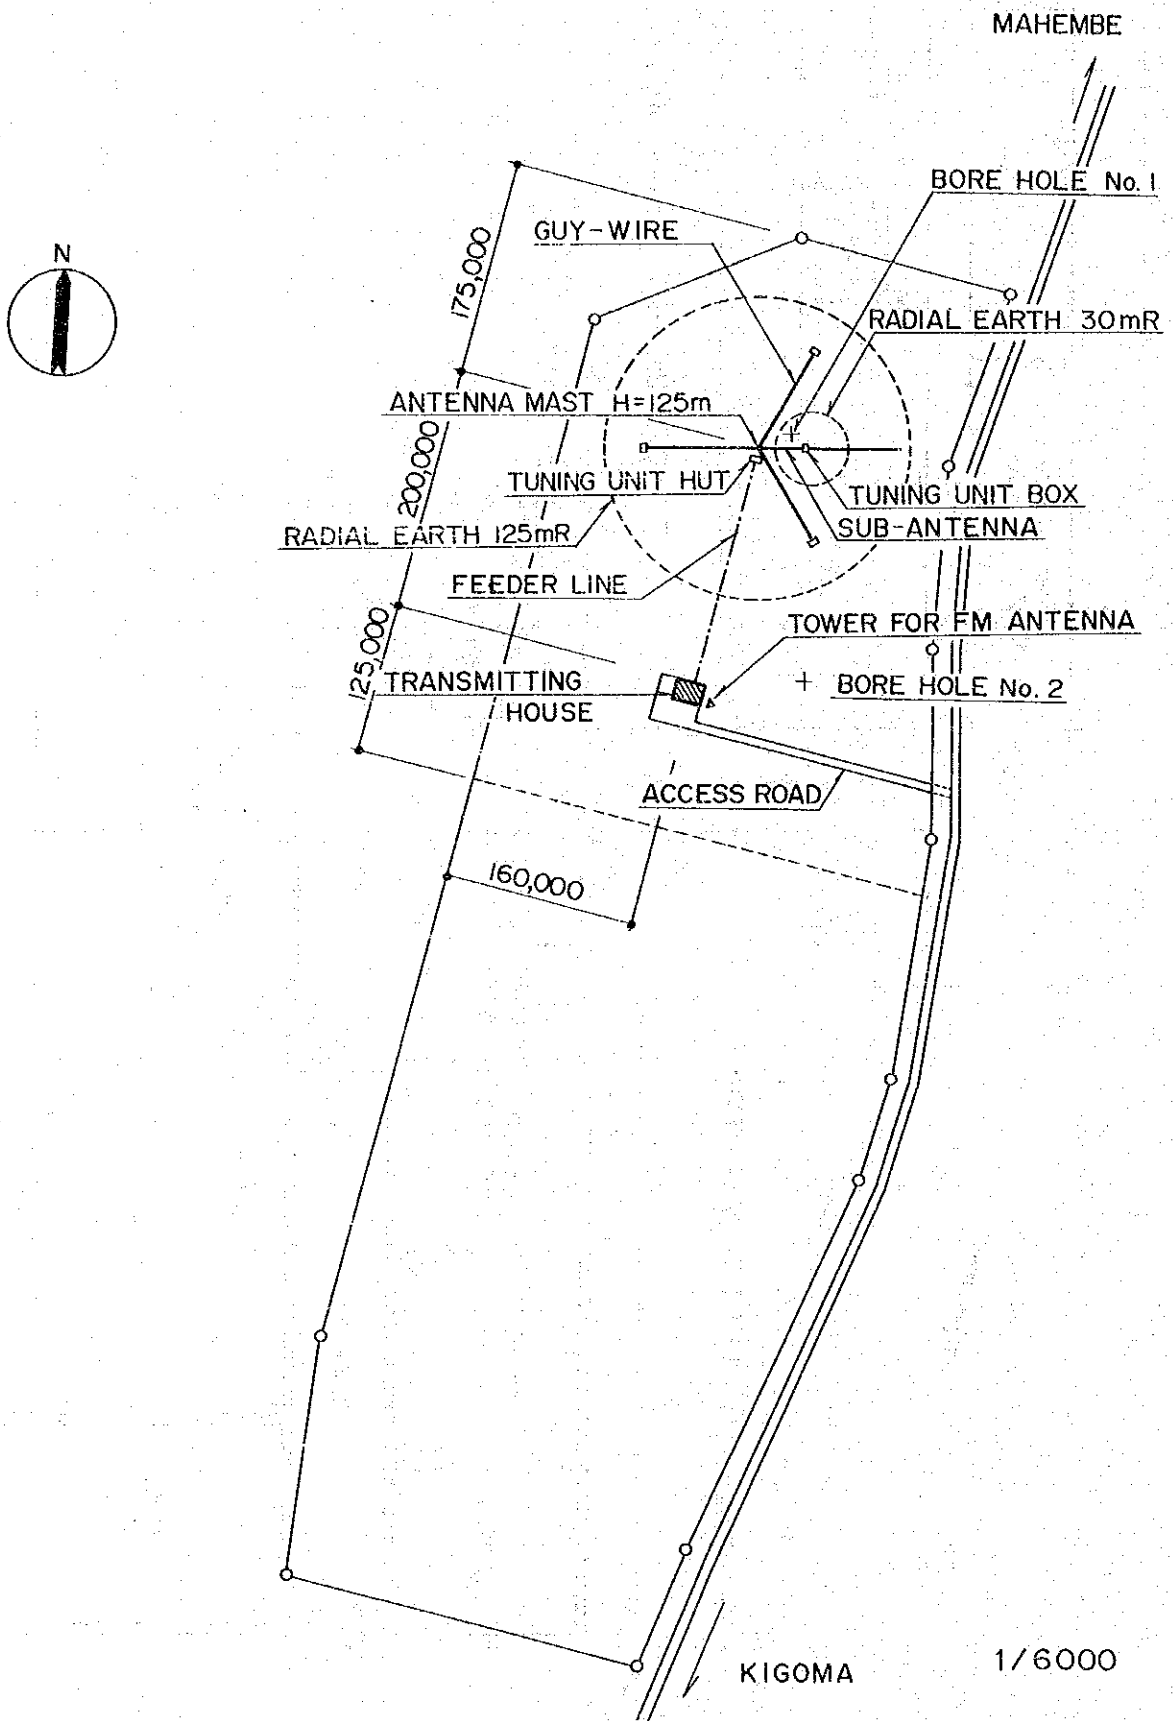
SITE PLAN OF KIGOMA TRANSMITTING STATION
